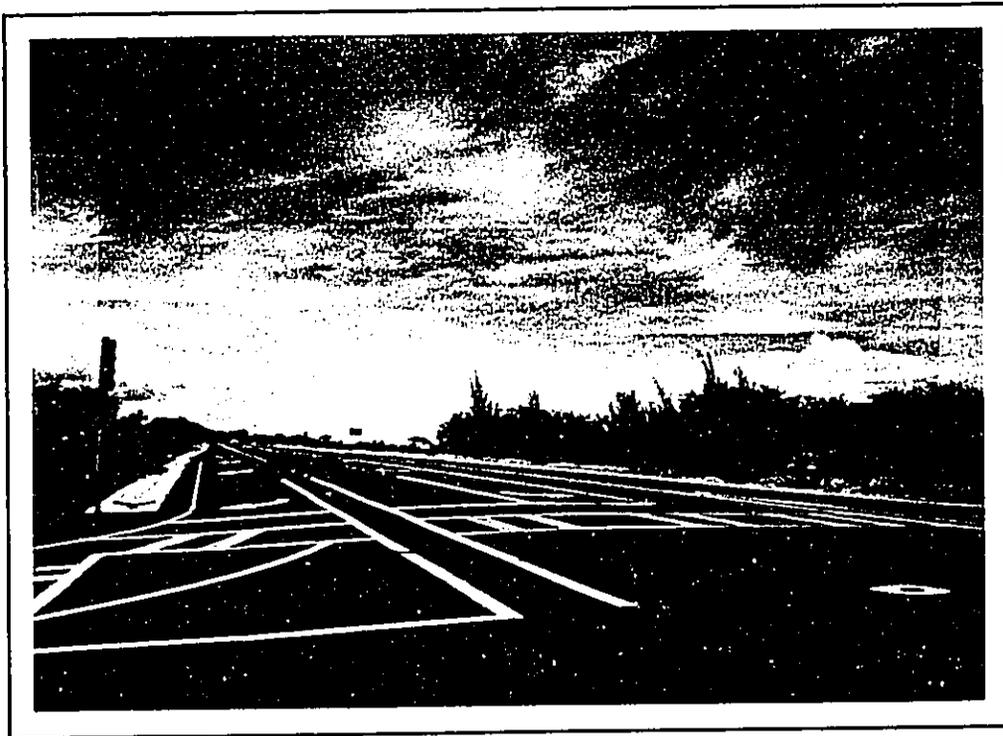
Looking north along Piilani Highway from southeast corner of Piilani Highway/Lipoa Street intersection.
